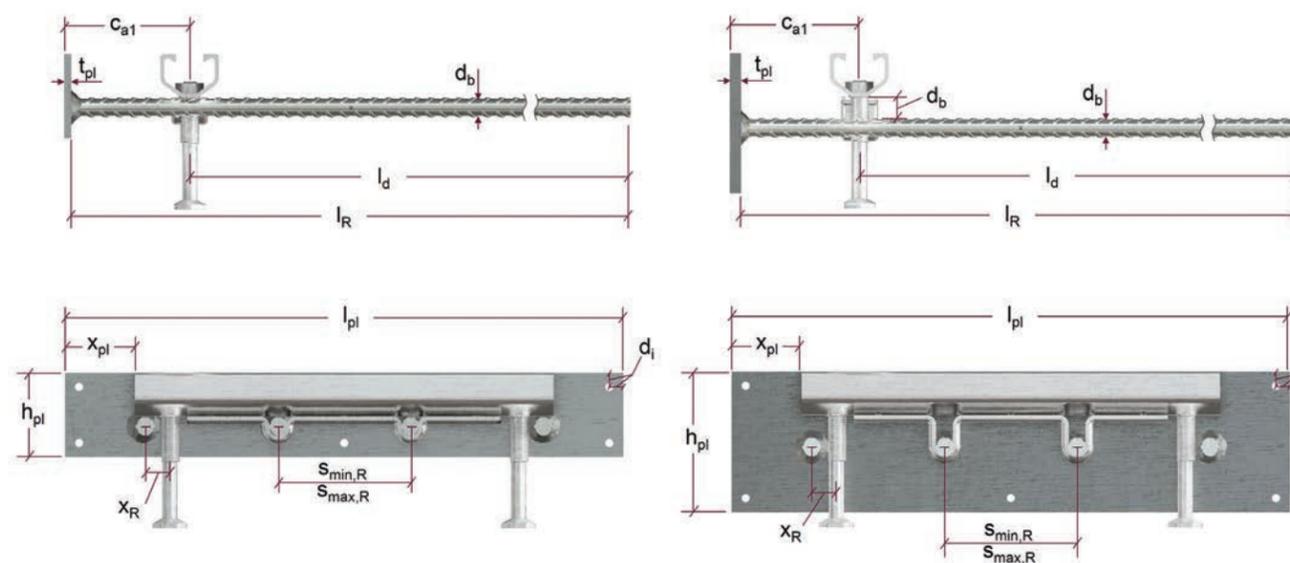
HAC-T EDGE Lite and HAC-T EDGE dimensions, section and elevation view.
